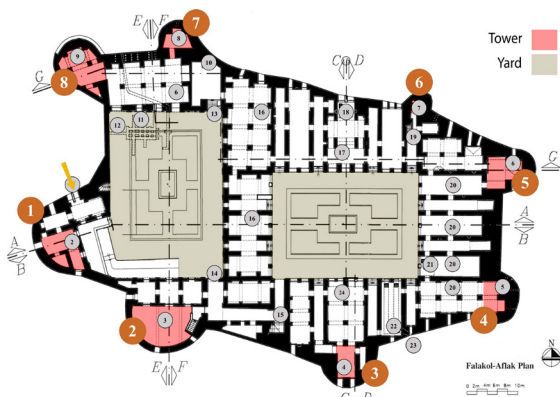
Asymmetrical Towers of the Castle and Non-symmetrical Plan. Source: Authors.
